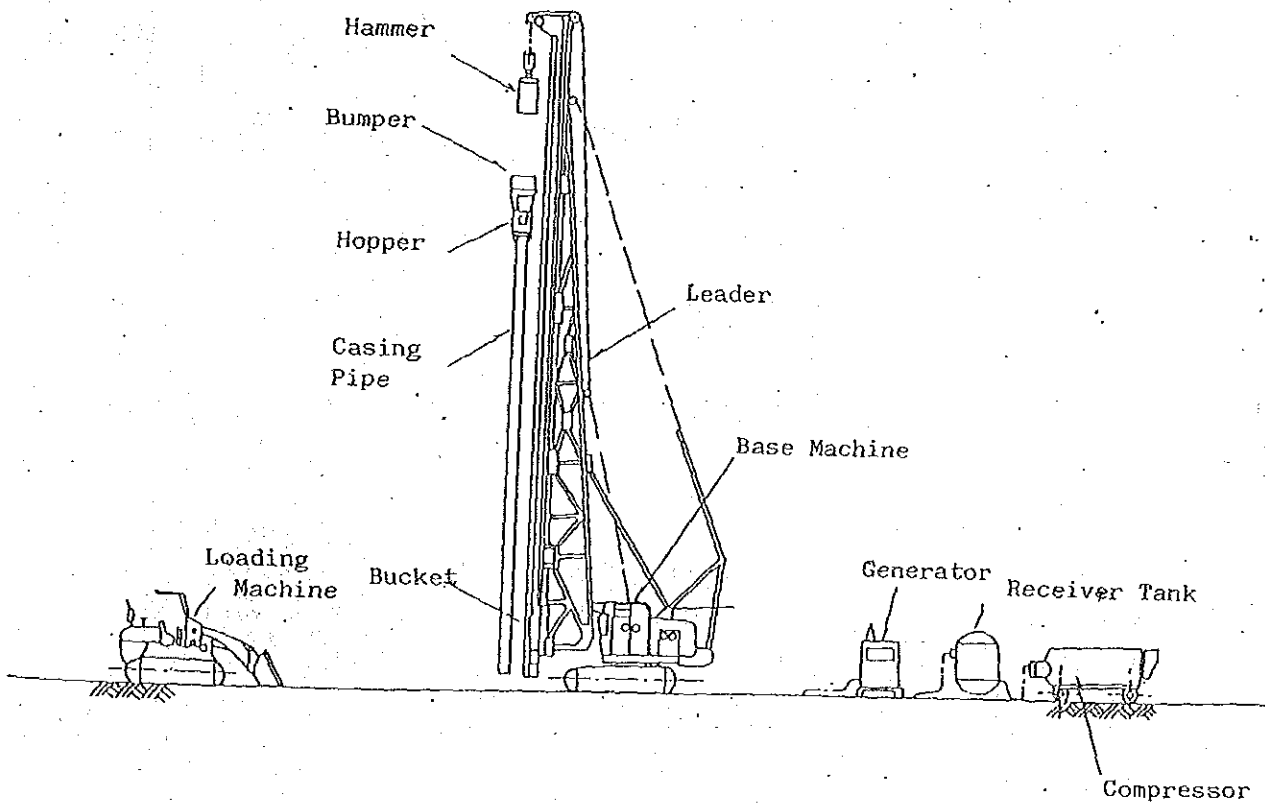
Typical Arrangement of Construction Equipment for Sand and Gravel Compaction Piles
